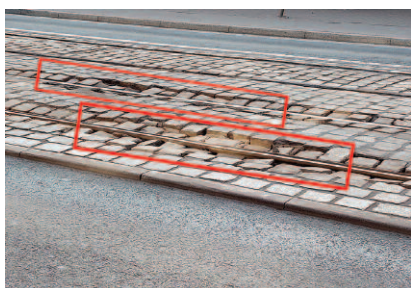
Collapse of stone cubes in the track area, J. Piłsudskiego Street (12/2023)
